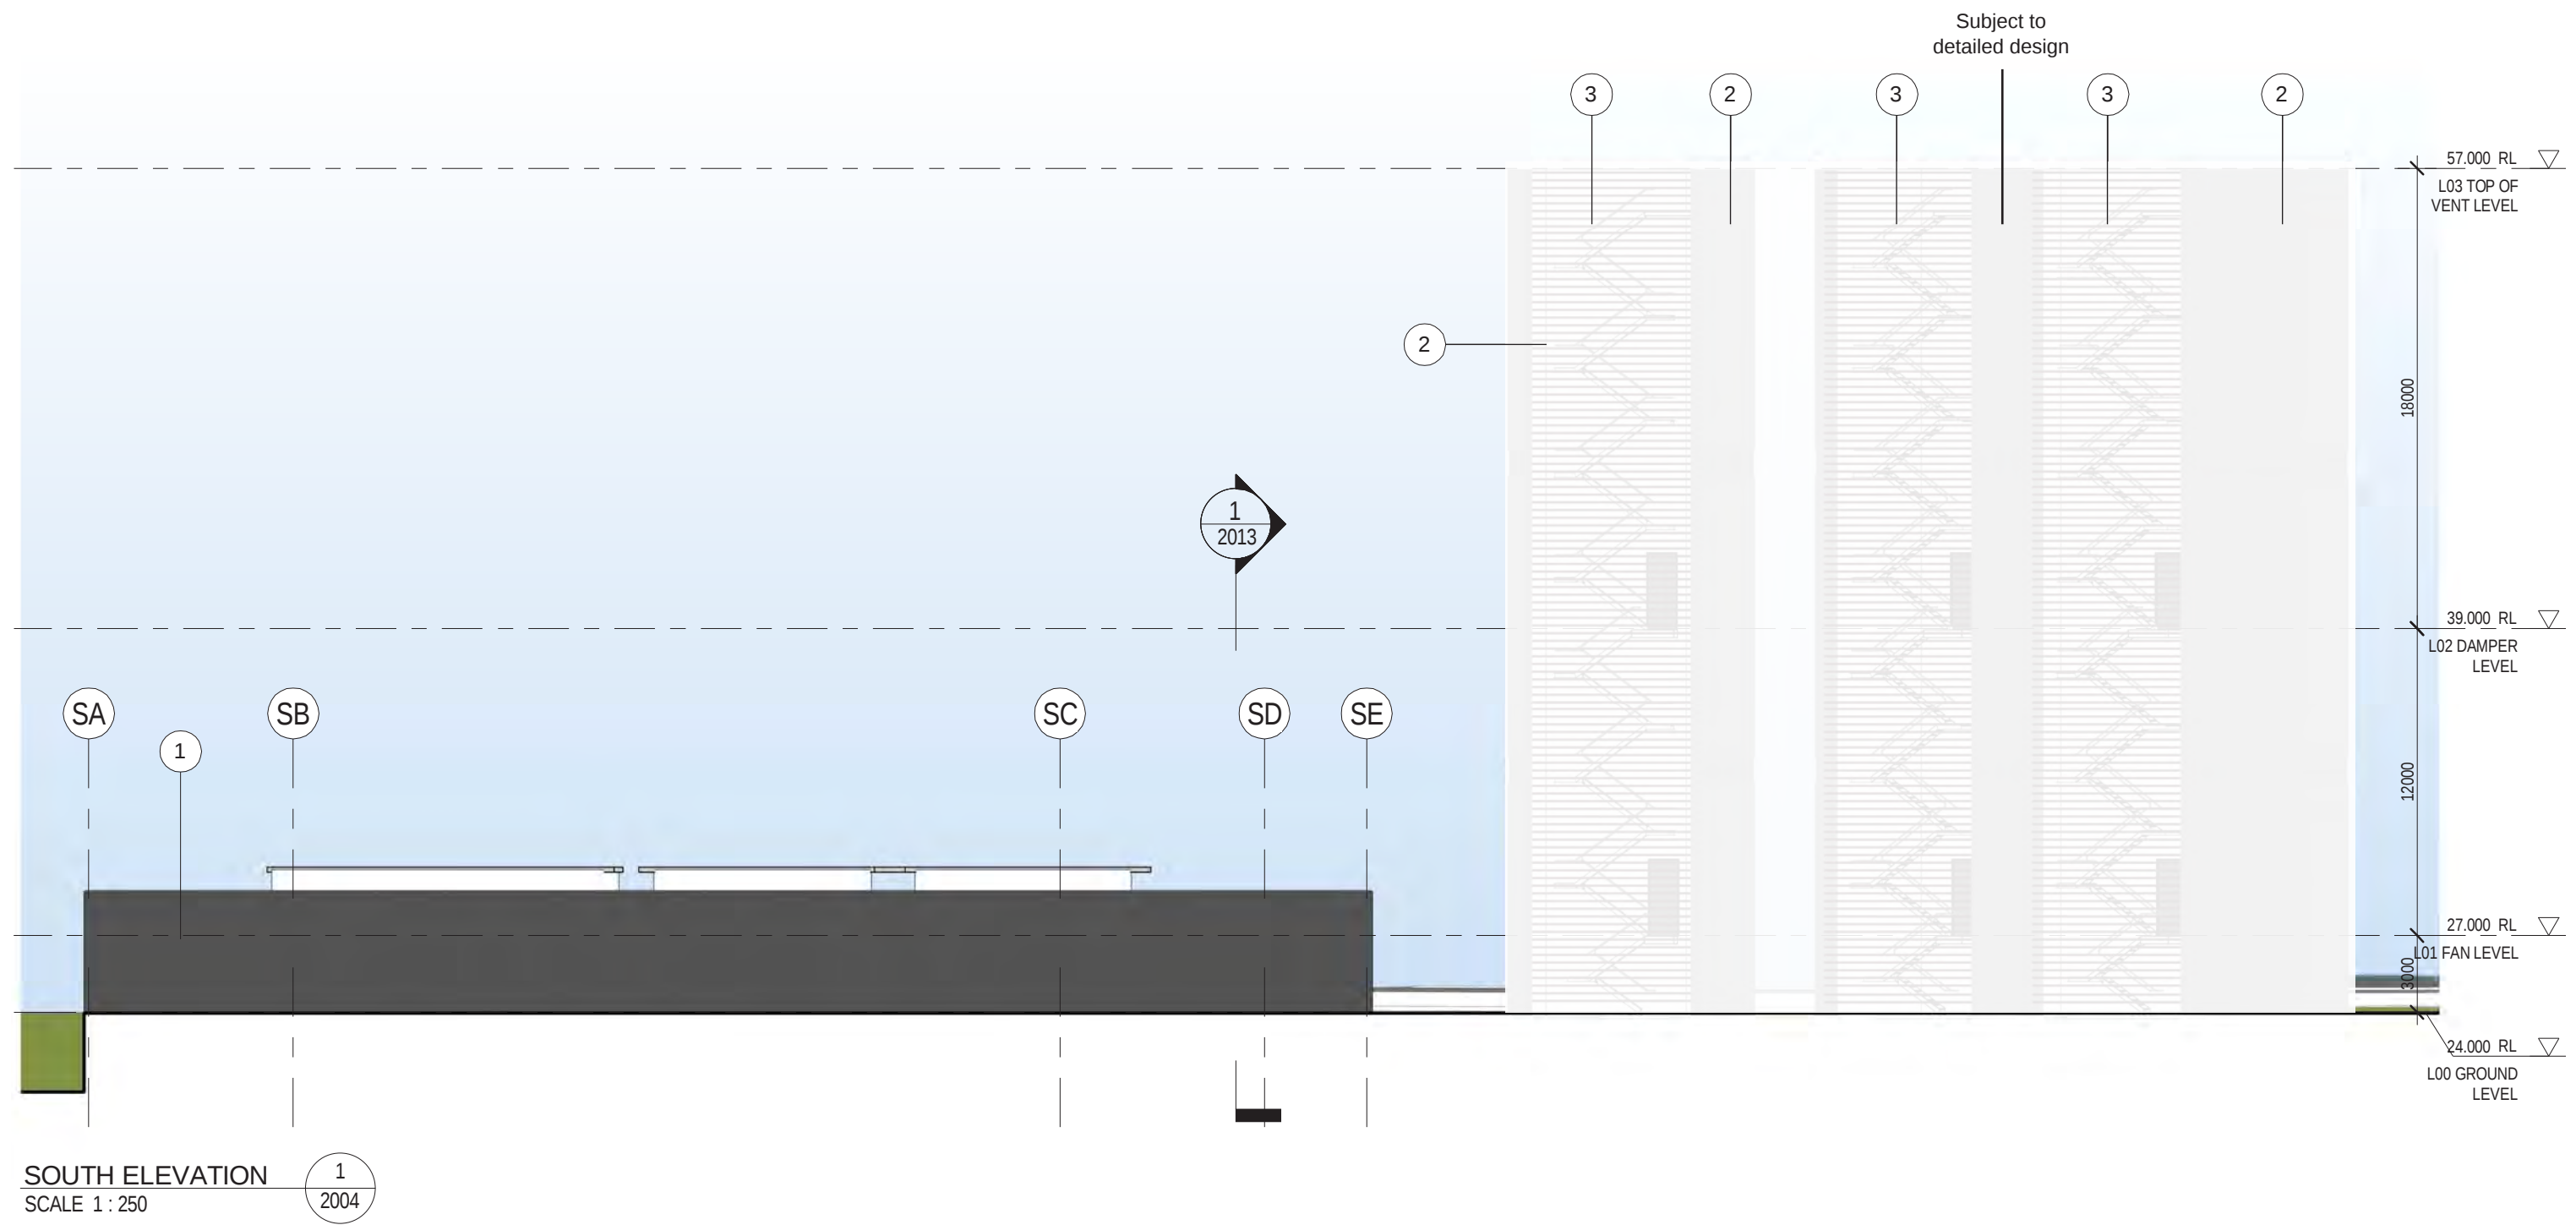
MOC1 facility at Kingsgrove indicative elevations
